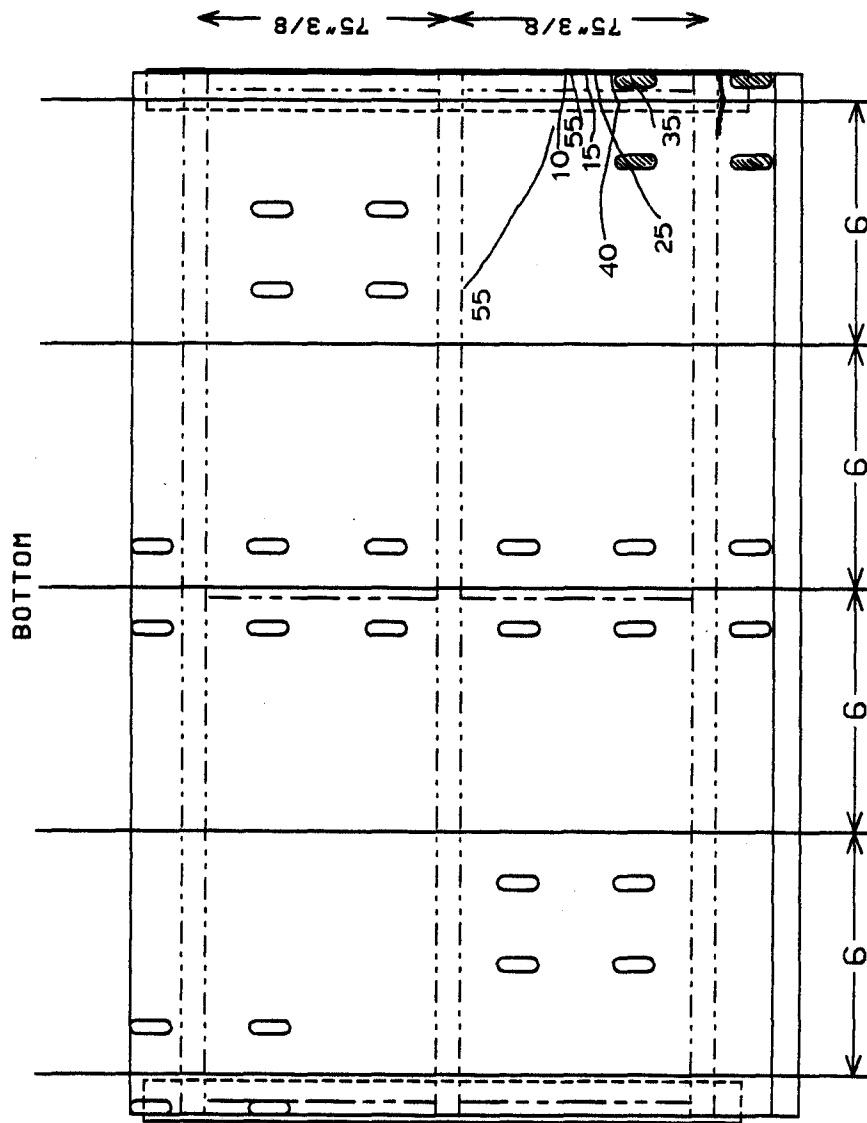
Bottom Cracking Pattern (Second Bridge - Test No. 7)
